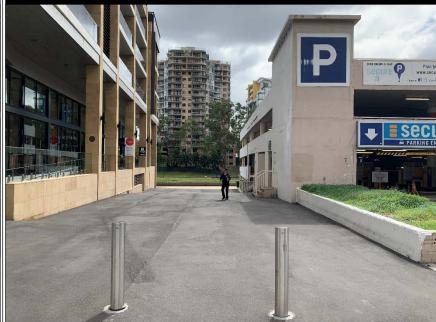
THREE STOREY CARPARK, FACING NORTH
